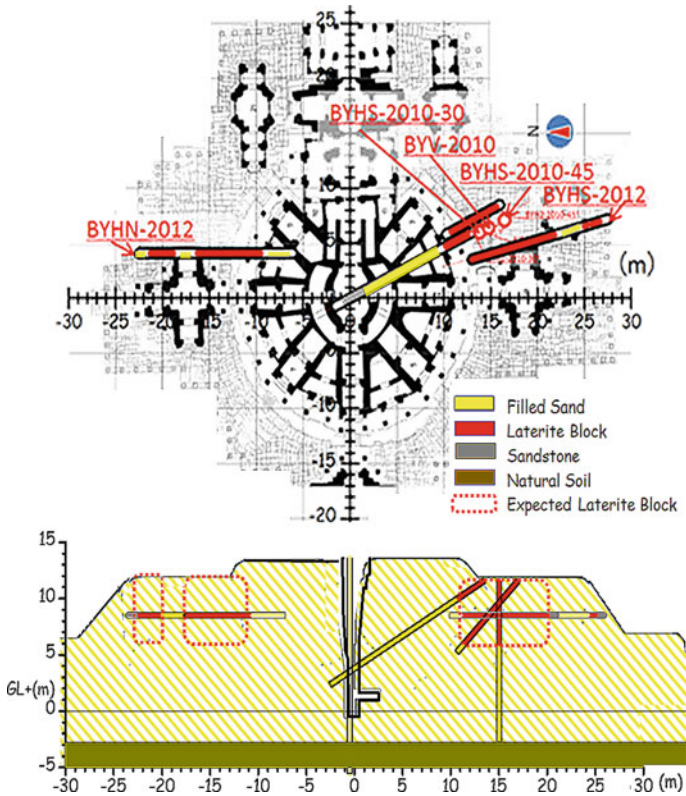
Boring at foundation platform mound of Central Tower, Bayon
